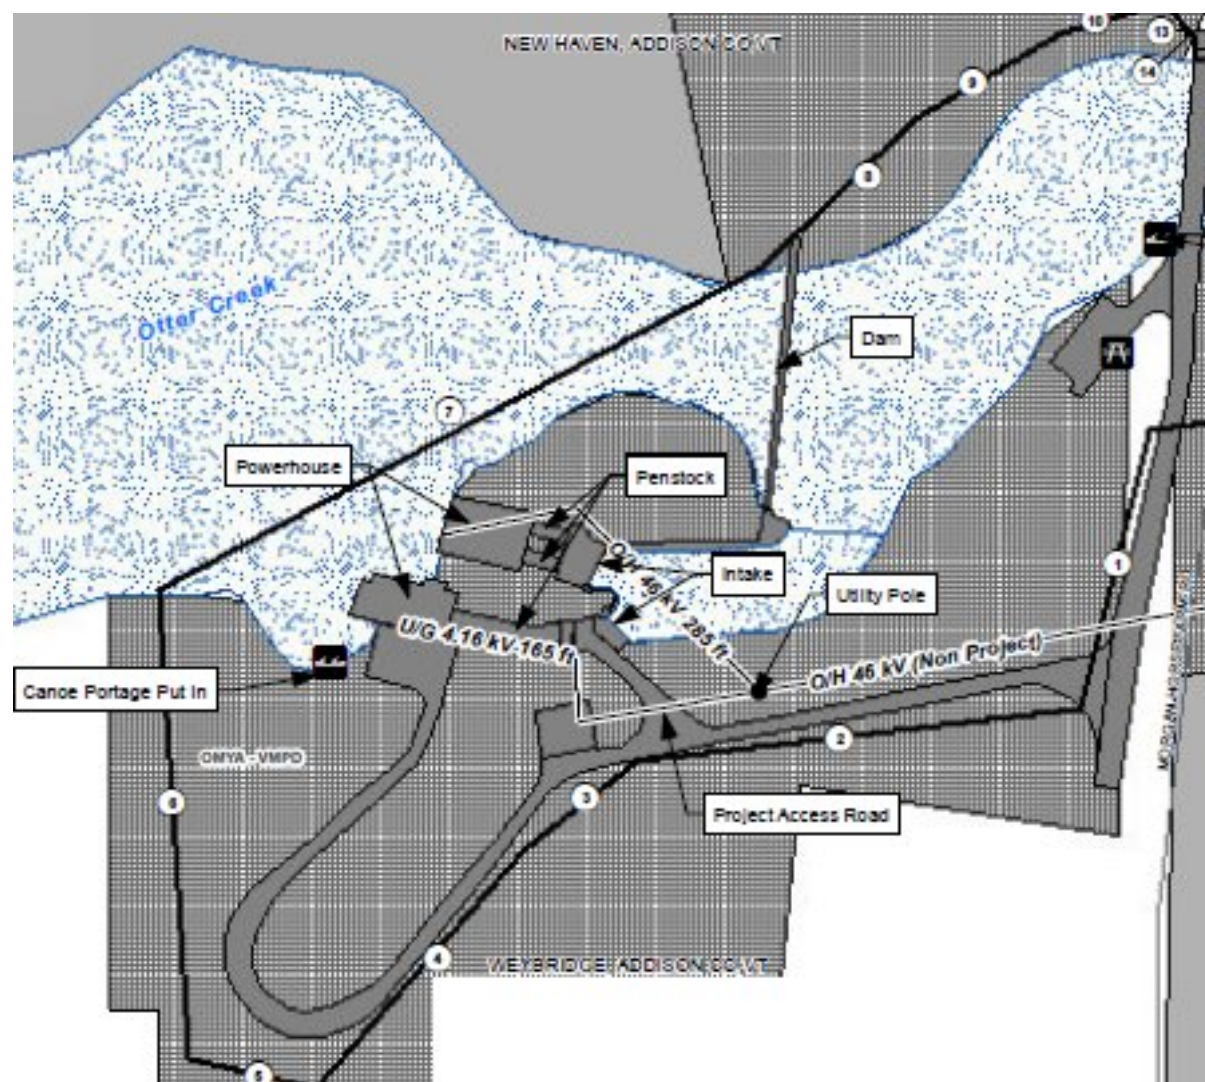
Huntington Falls development site plan. (Source: Central Vermont, 2011, as modified by Staff)
